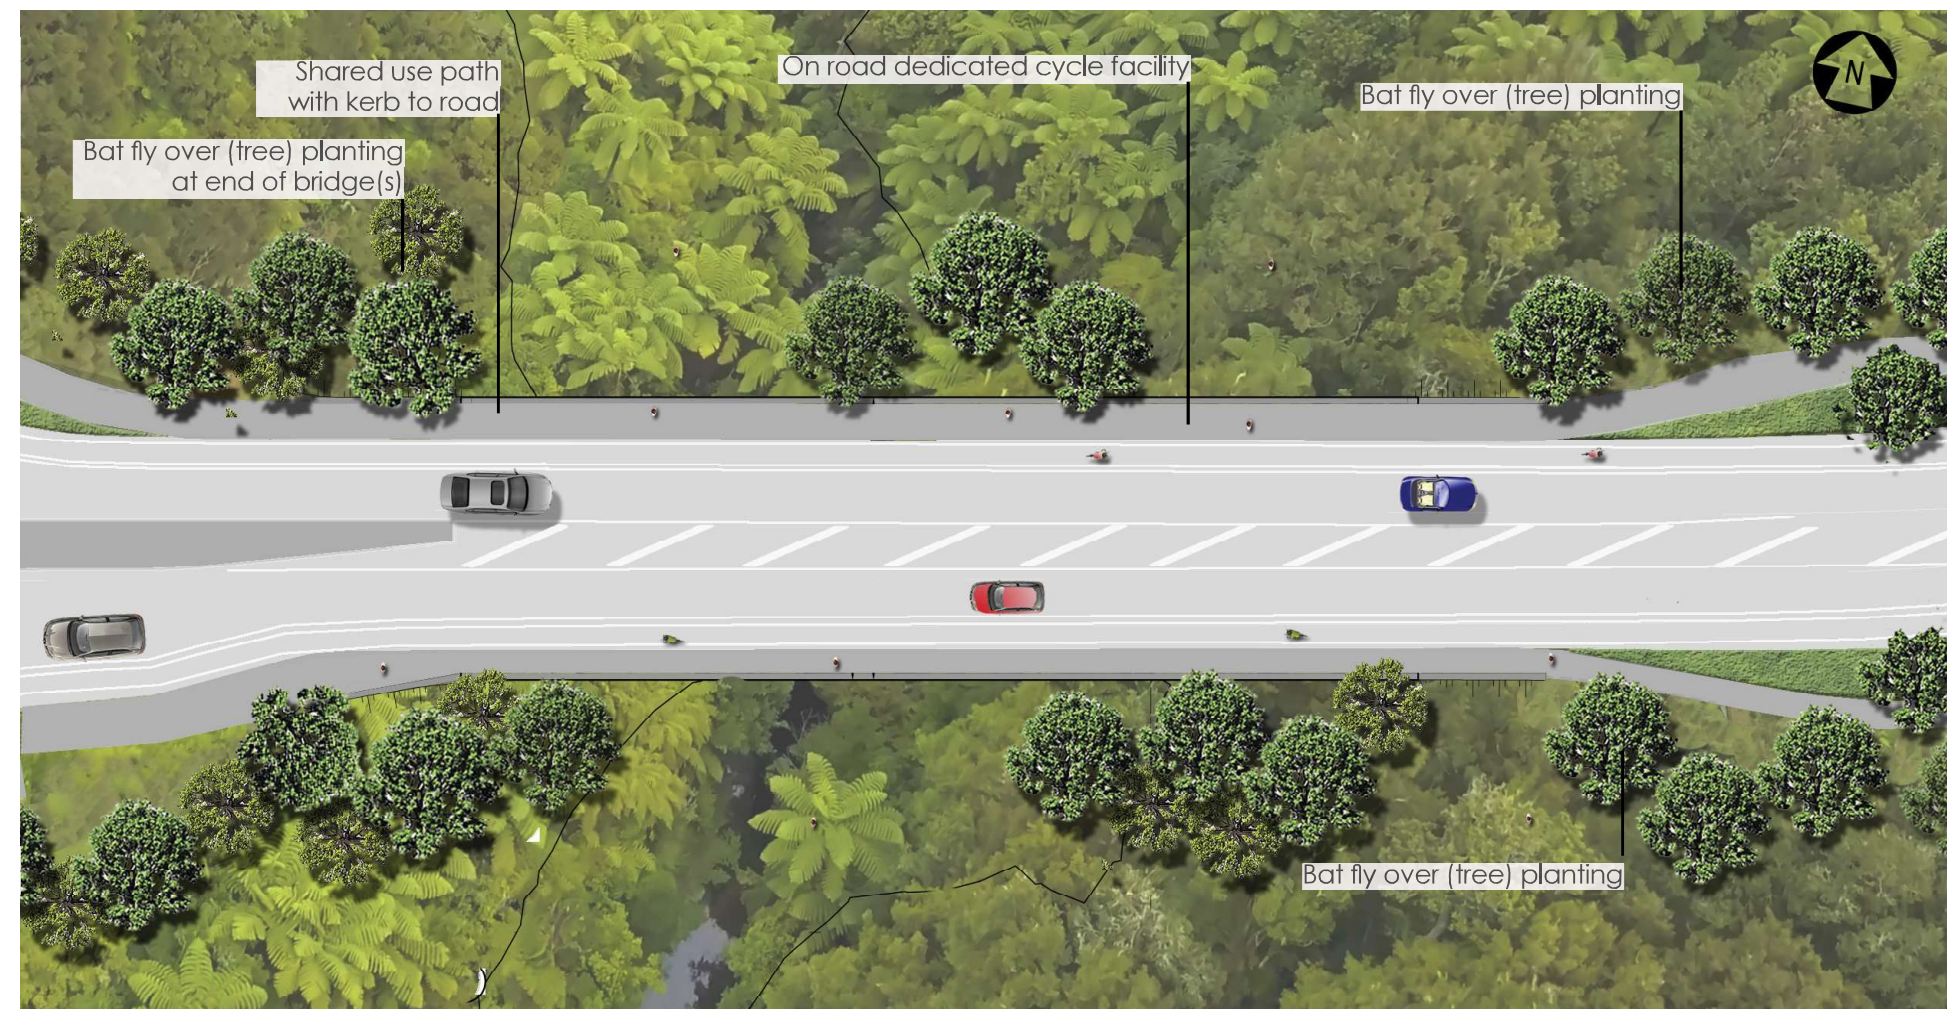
PLAN OF THE MANGAKOTUKUTUKU GULLY BRIDGE
